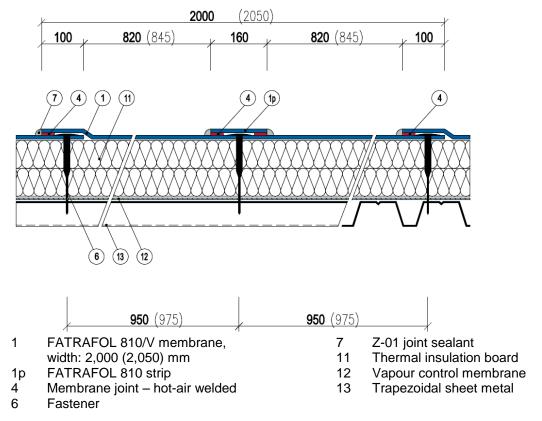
Fastening of FATRAFOL 810 in centre of sheet and covering it with membrane strip
